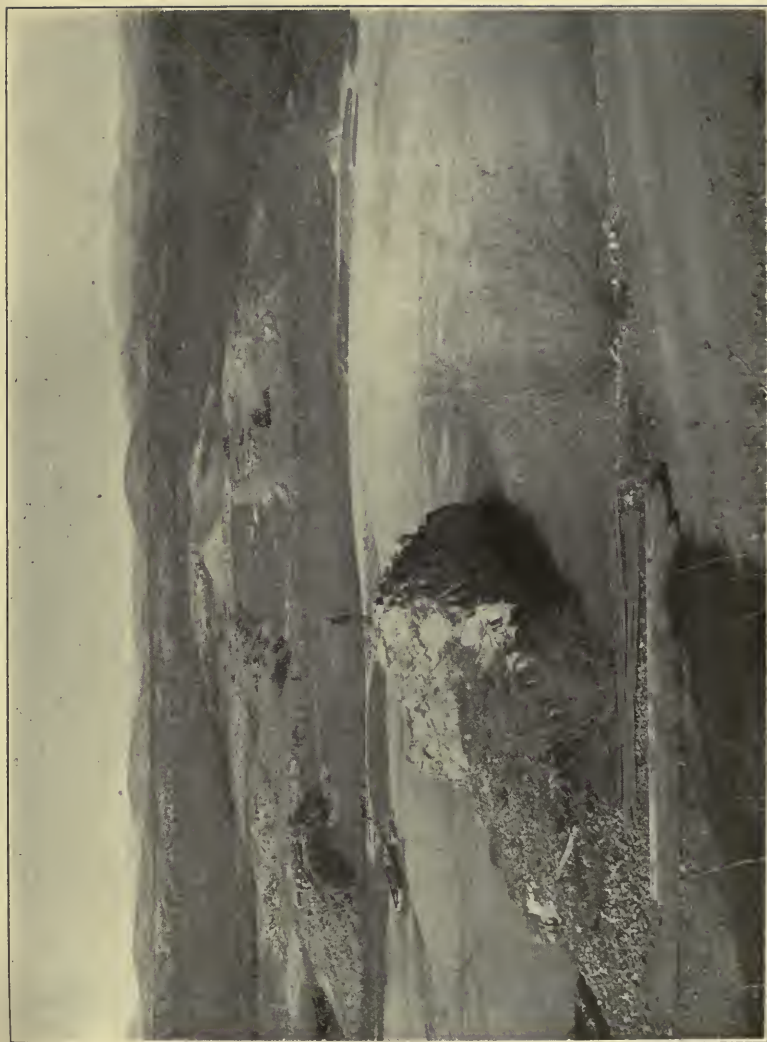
PLATE VII.—Site of Leasburg Diversion Dam on Rio Grande. Under construction. Canal gates will be set in Penasco Rock in foreground. Concrete dam will extend from Penasco Rock to join embankment in distance.
